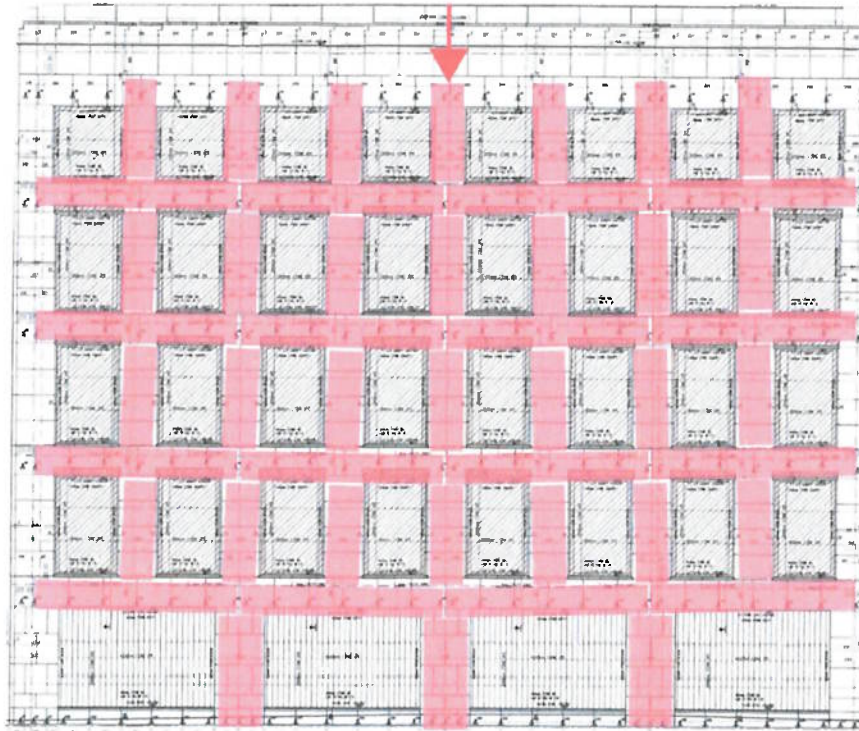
South elevation. Differential settlement causes rocking of stone piers.
